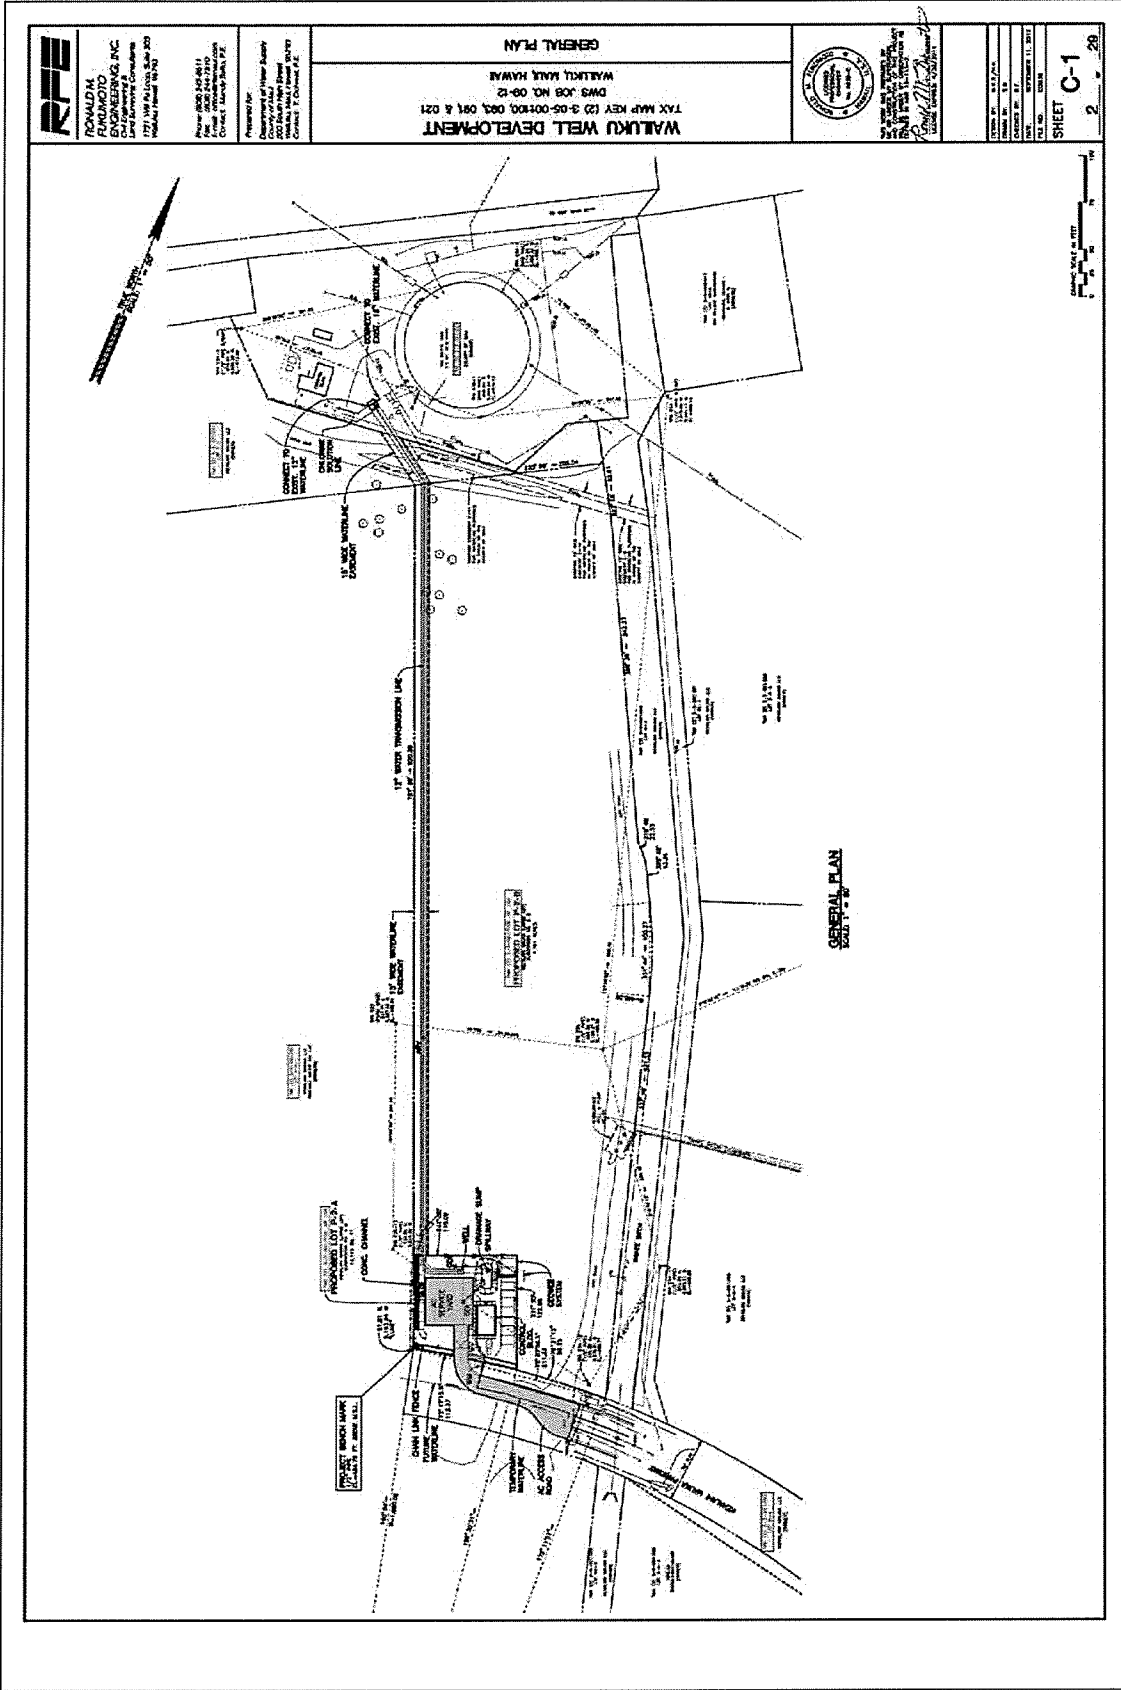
Plan View of Project Area Showing Proposed Well Site (plan courtesy of client).
